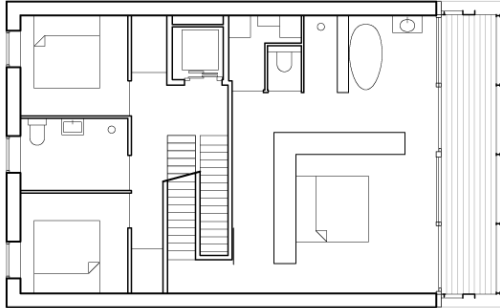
Second floor plan. Photo by BETA Architects (www.beta-office.com/project/3-generation_house)
